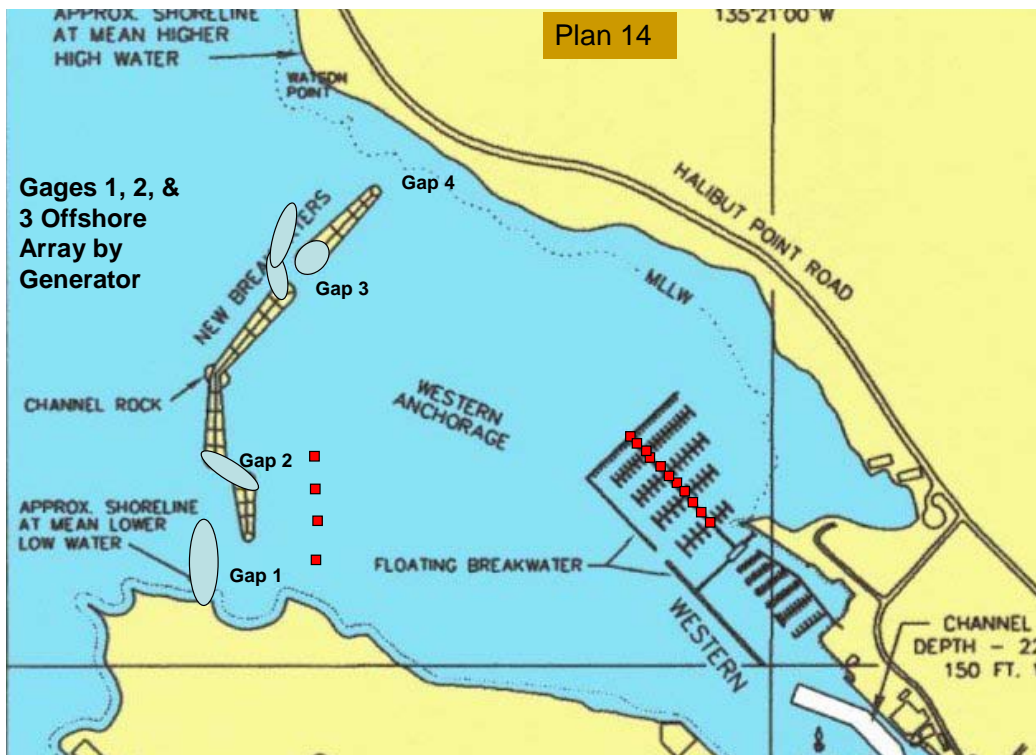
Plan 14 is a combination of Plan 1, Plan 4, and Plan 15.
